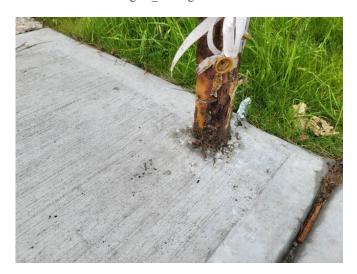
Aug 15_ Railing Imbedded in Concrete_Corrossion Present
